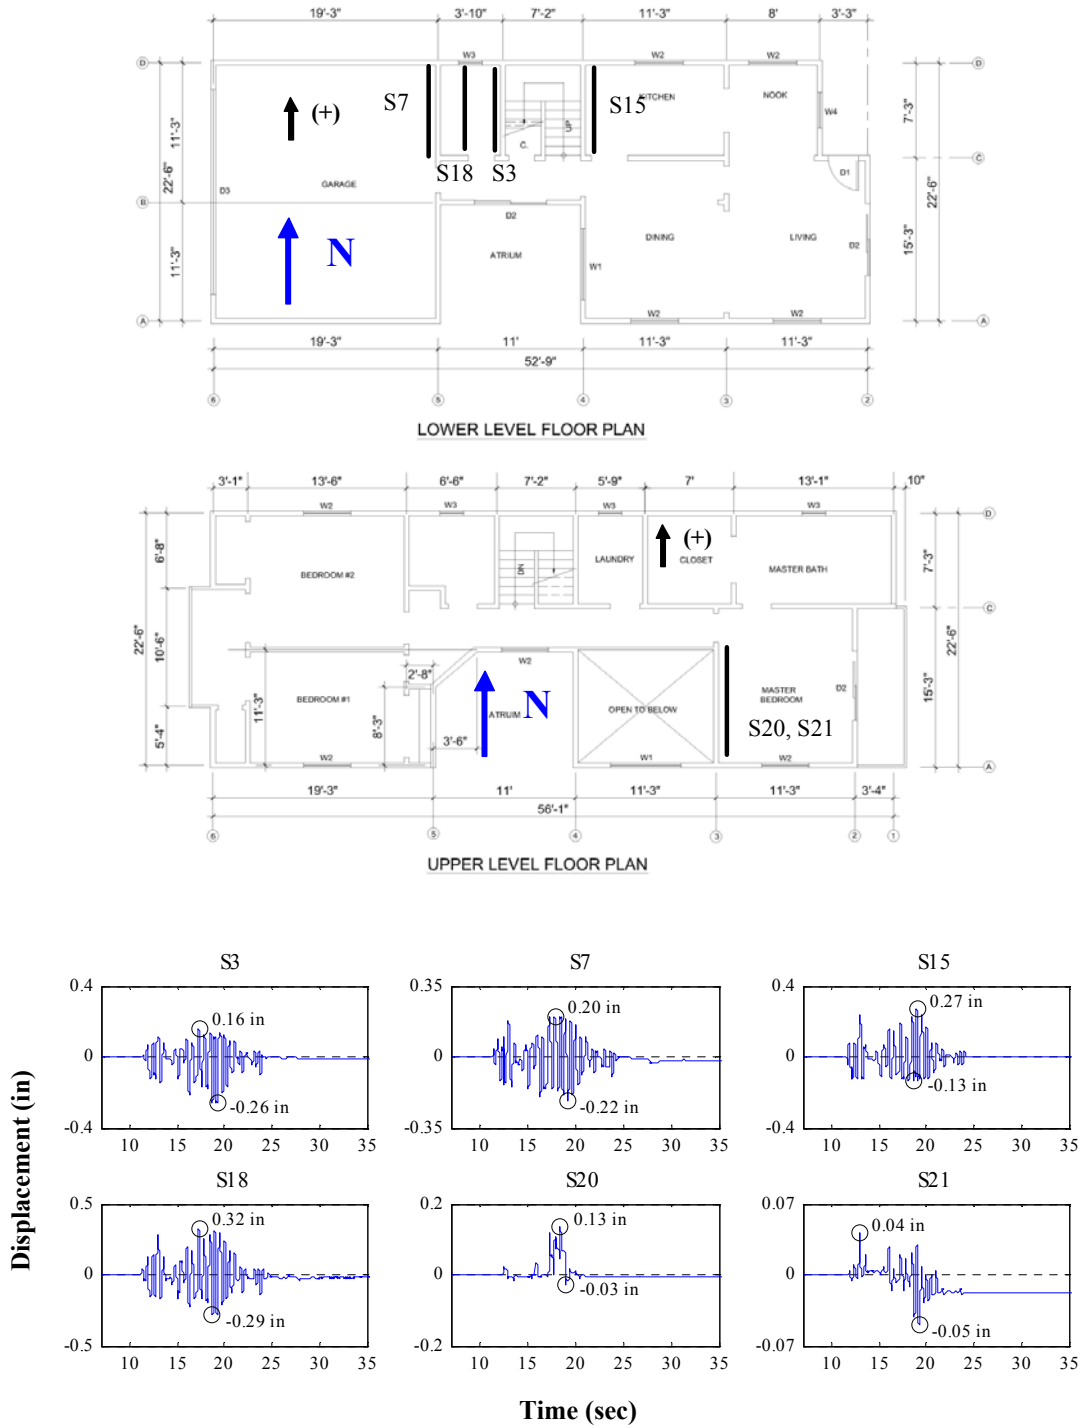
Wall deformations of internal walls for Test NWP5S06
